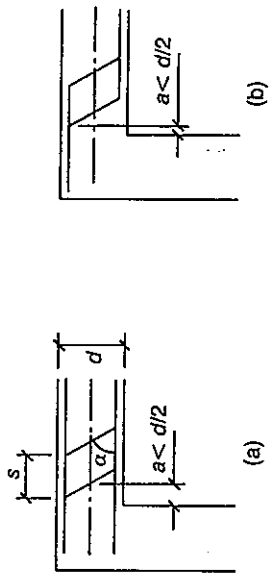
Recommended spacing of shear reinforcement: (a) stirrups; (b) bent-up bars
